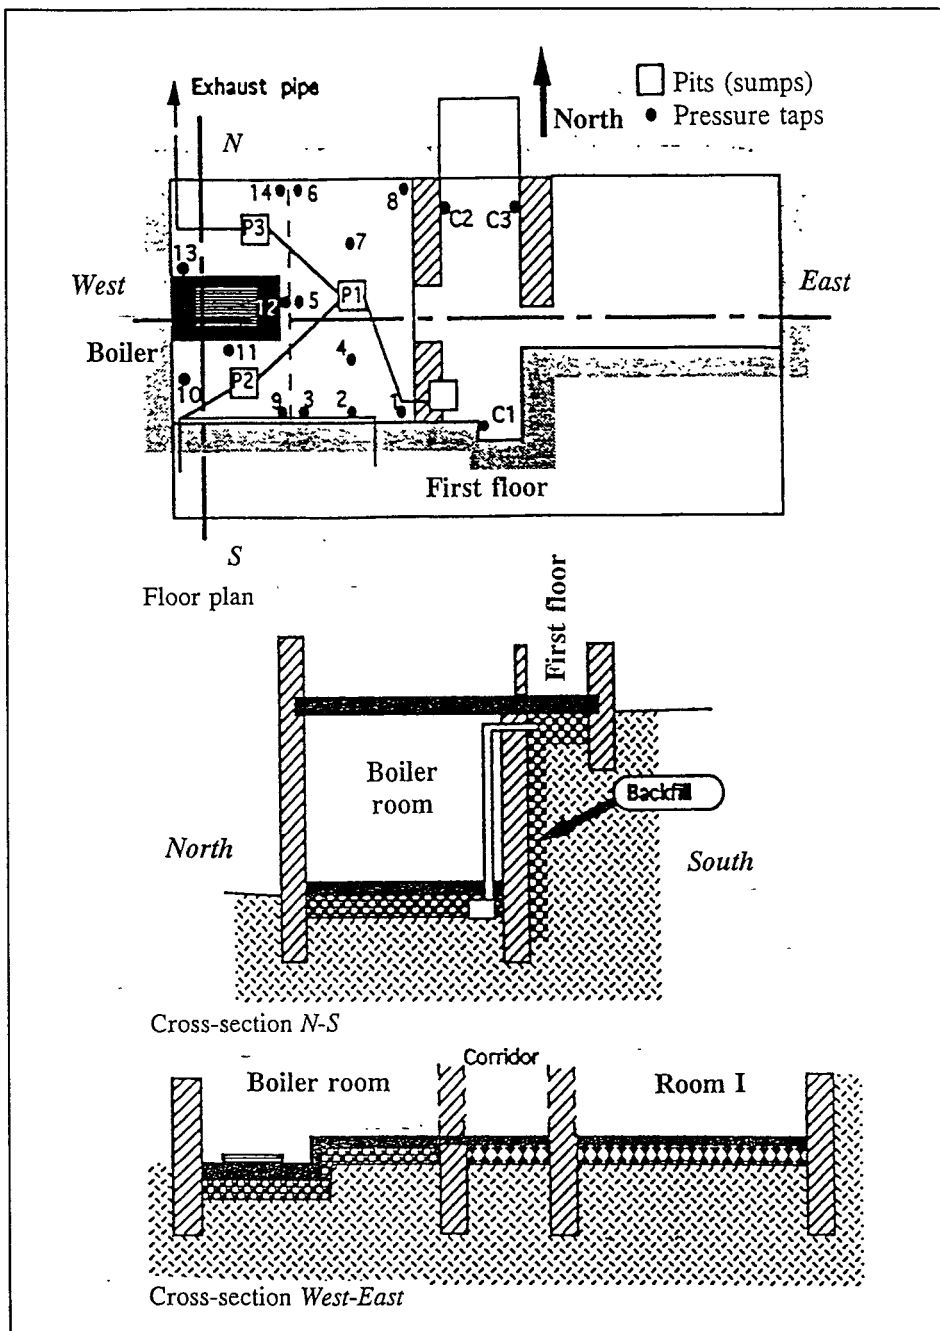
Floor plan view with sumps and pressure taps locations (at top), and vertical cross sections of the basement of the high radon test house.
